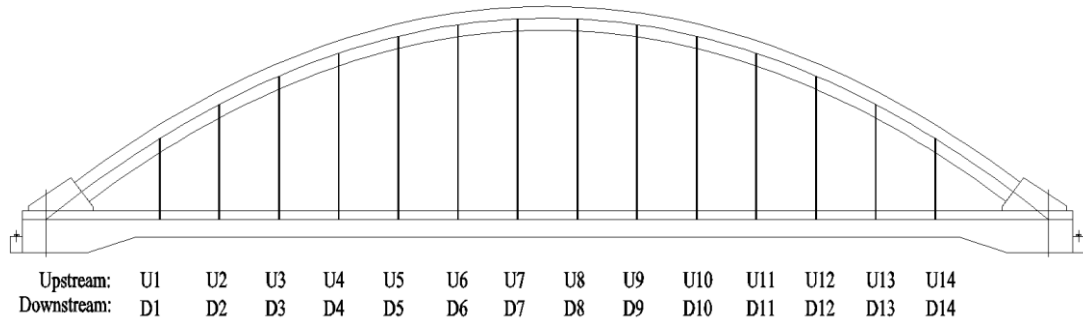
Hanger cable arrangement of Guitang River Bridge
